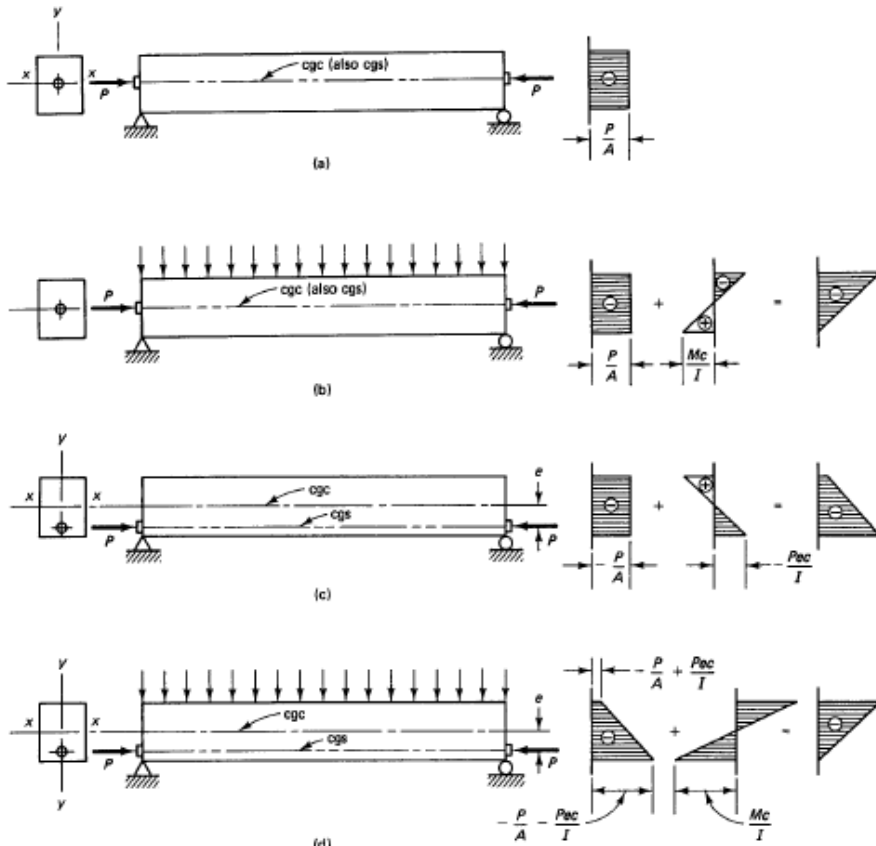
Concrete fiber stress distribution in a beam with straight tendon.
